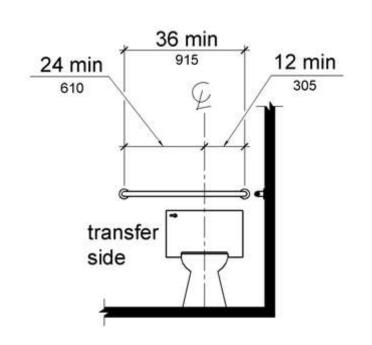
Rear Wall Grab Bar at Water Closets
